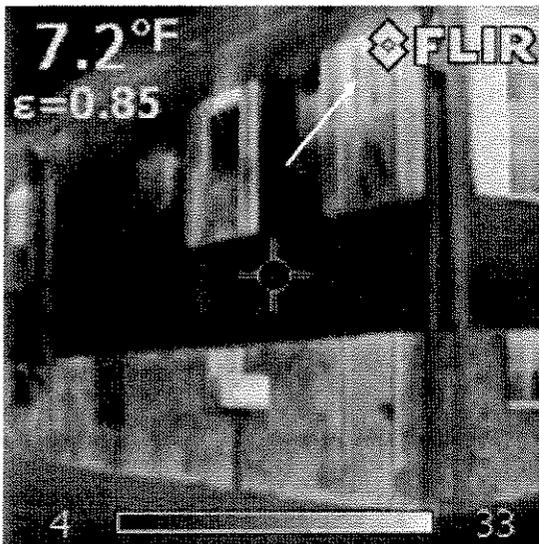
Police Dept. front-left wall. Foundation wall leaks heat more than wood frame wall. Significant heat leaks around windows and above wall AC unit.
